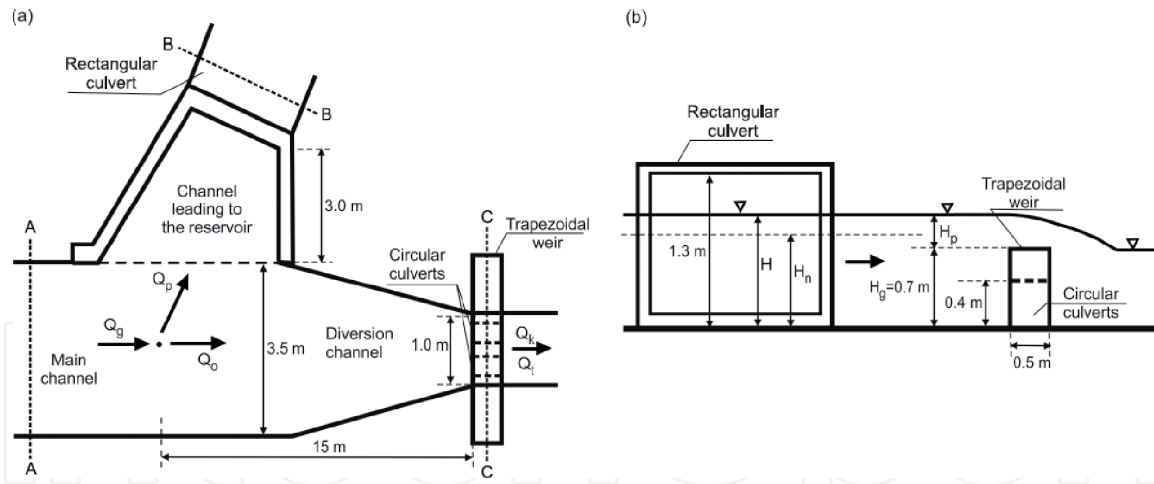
Plan and longitudinal section of a rectangular culvert and a trapezoidal weir [4]. (a) Plan of culvert and weir, and (b) Longitudinal section of culvert and weir.
